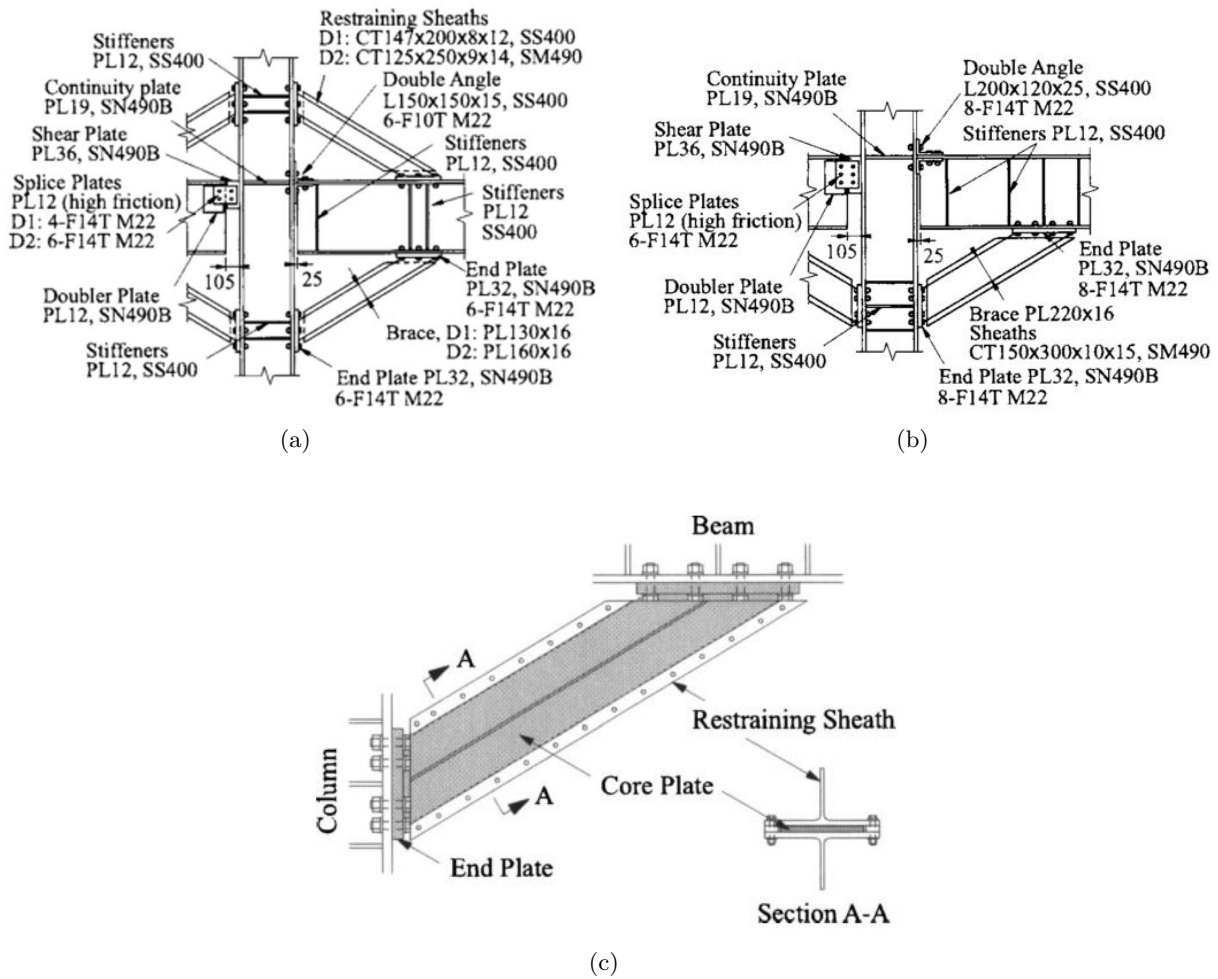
Weld free assembly of the connection investigated with (a) double side bracing and (b) single side bracing (b) detailing and section of the bracing connection members (Inoue et al., 2006)
